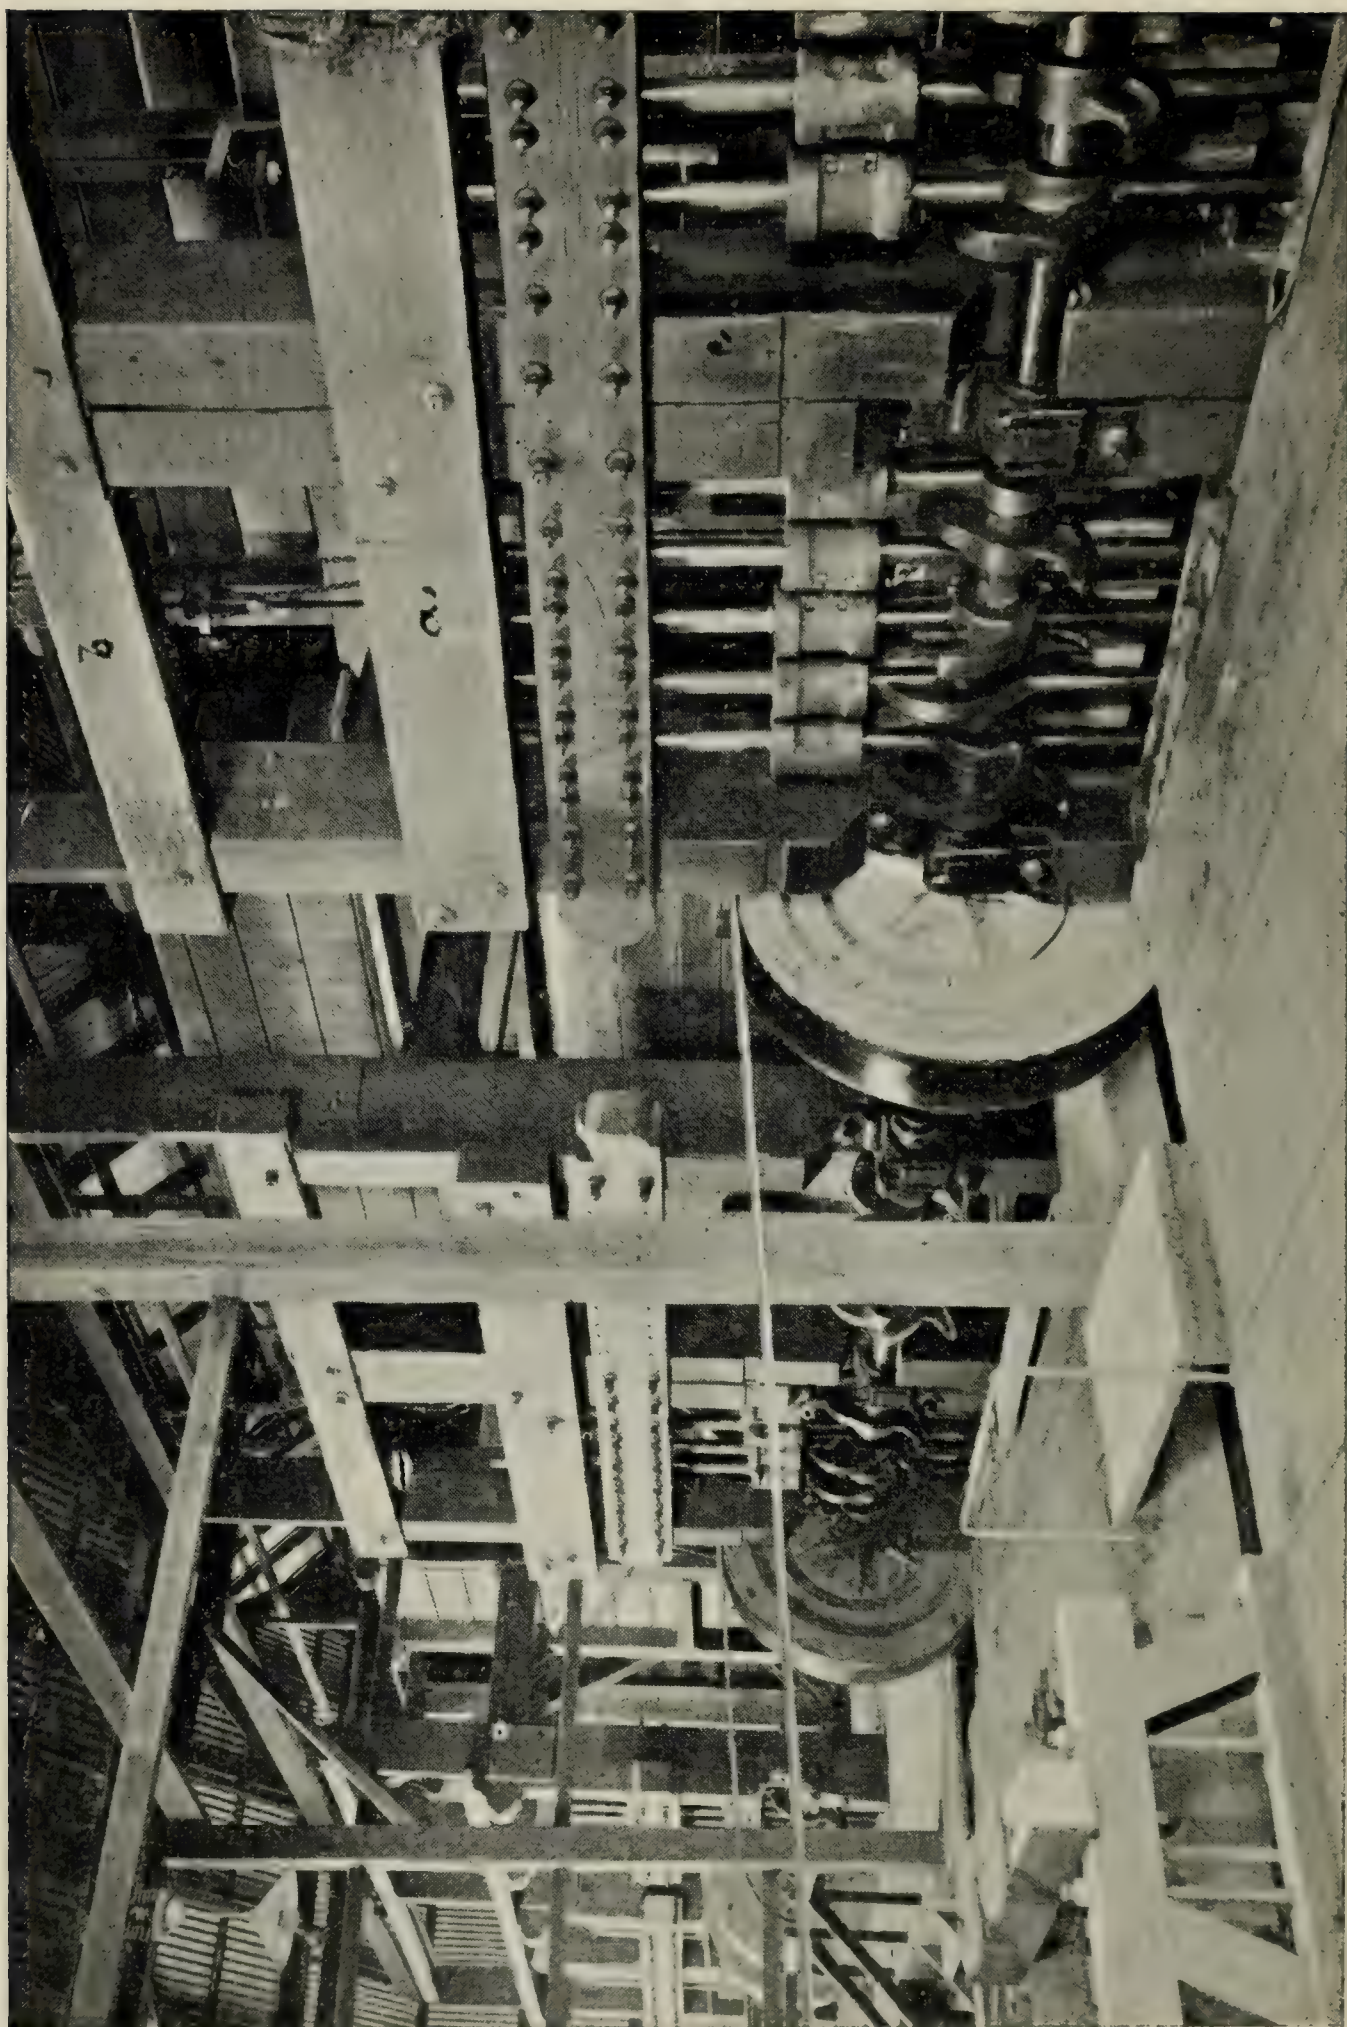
BATTERY FRAMING AND CAM FLOOR.
